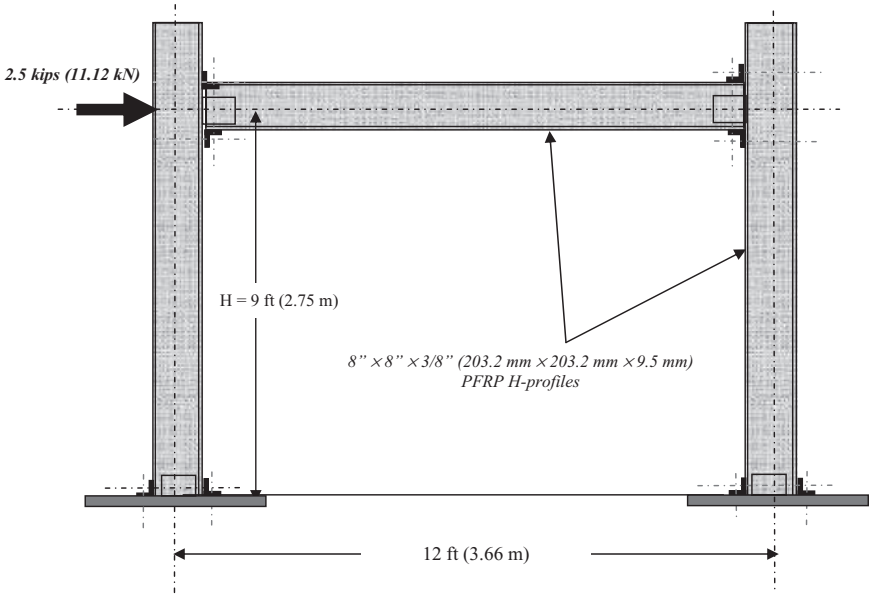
Details and loading of the PFRP frame of Example 8-5.
